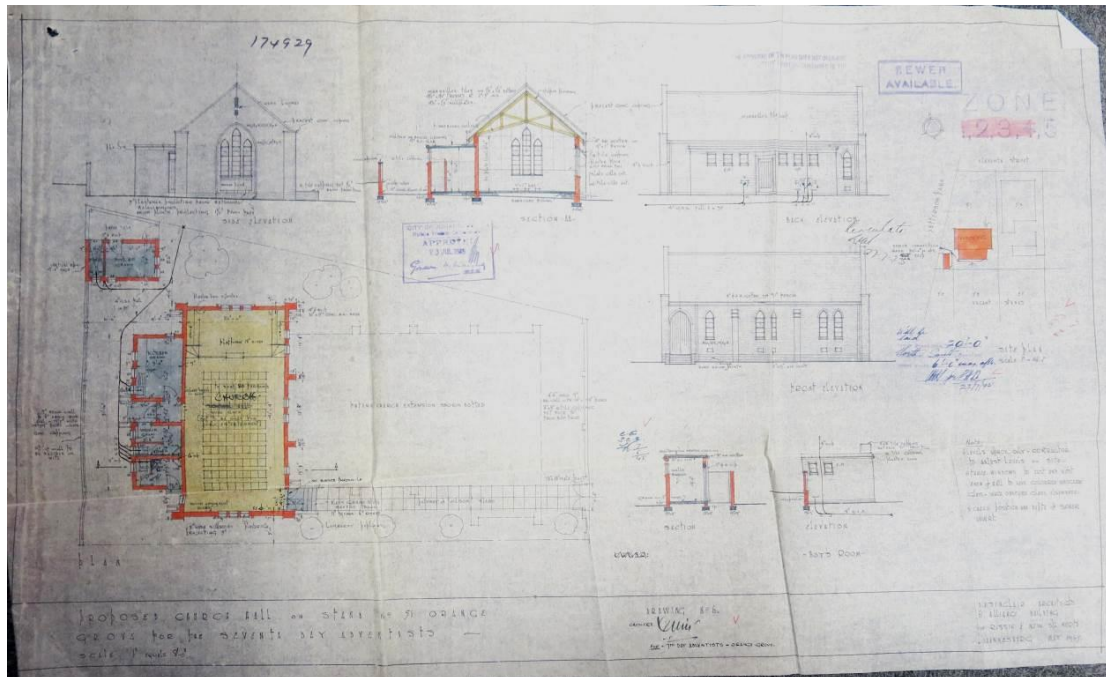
Proposed Church Hall on Stand 51, Orange Grove for the Seventh Day Adventists Plan was drawn in 1945 and Church building erected in 1949 (Source: City Council of Johannesburg, Plans Archive)
